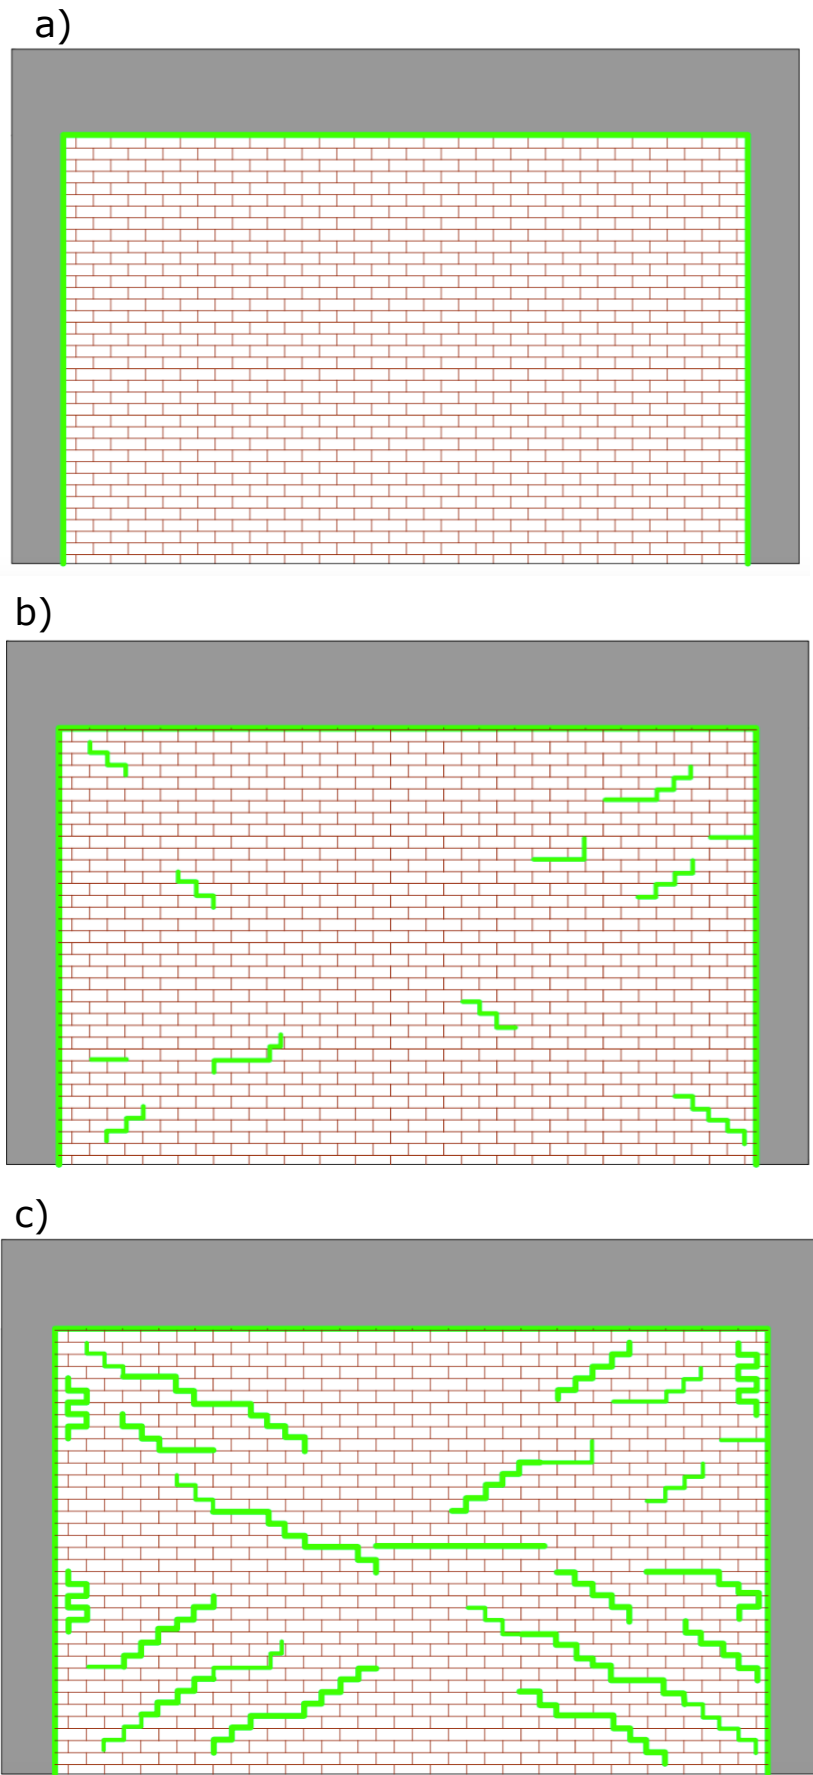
Types of damage in masonry infill walls. a) Separation of the wall. b) Slight damage on the wall. c) Severe damage on the wall.
